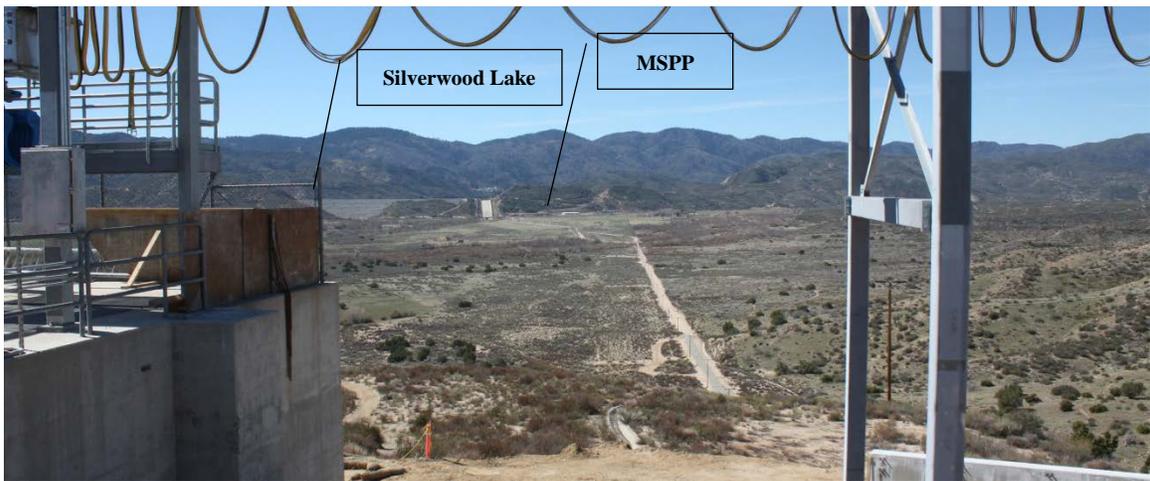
View looking south toward Silverwood Lake from Check 66.
